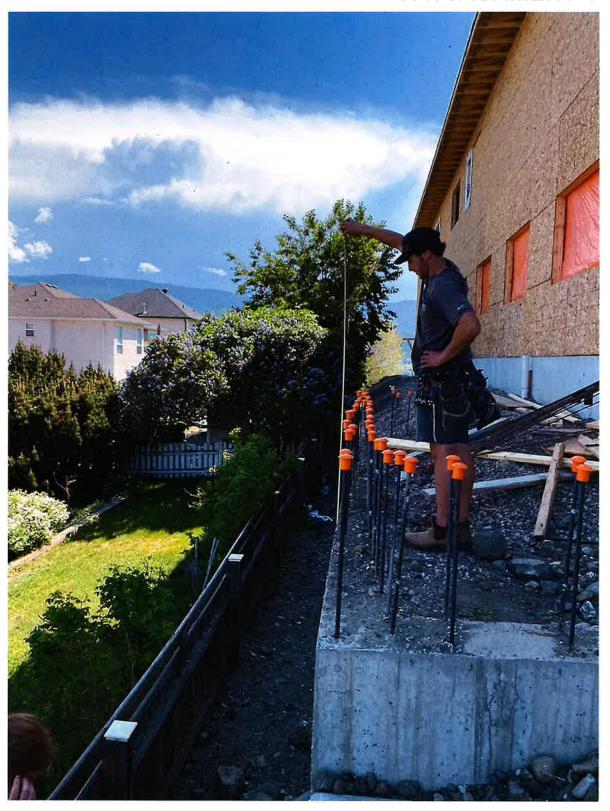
Proposed retaining wall/fence height adjacent to proposed suite patio (NE corner)
